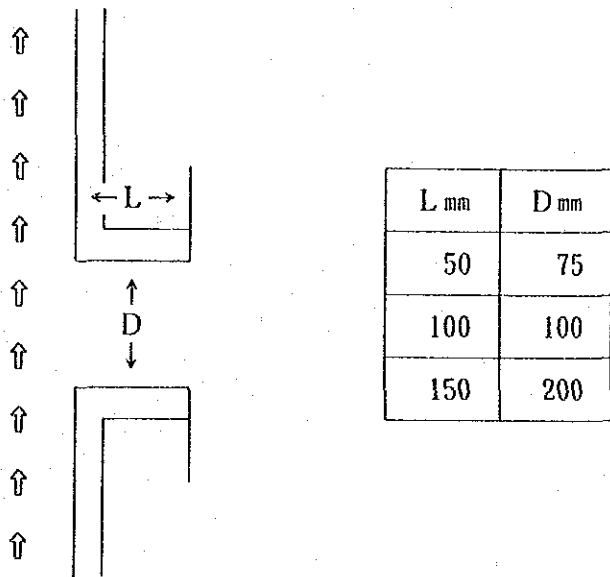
Dimensions of Gas Duct Measuring Hole at Inlet and Outlet of ESP
